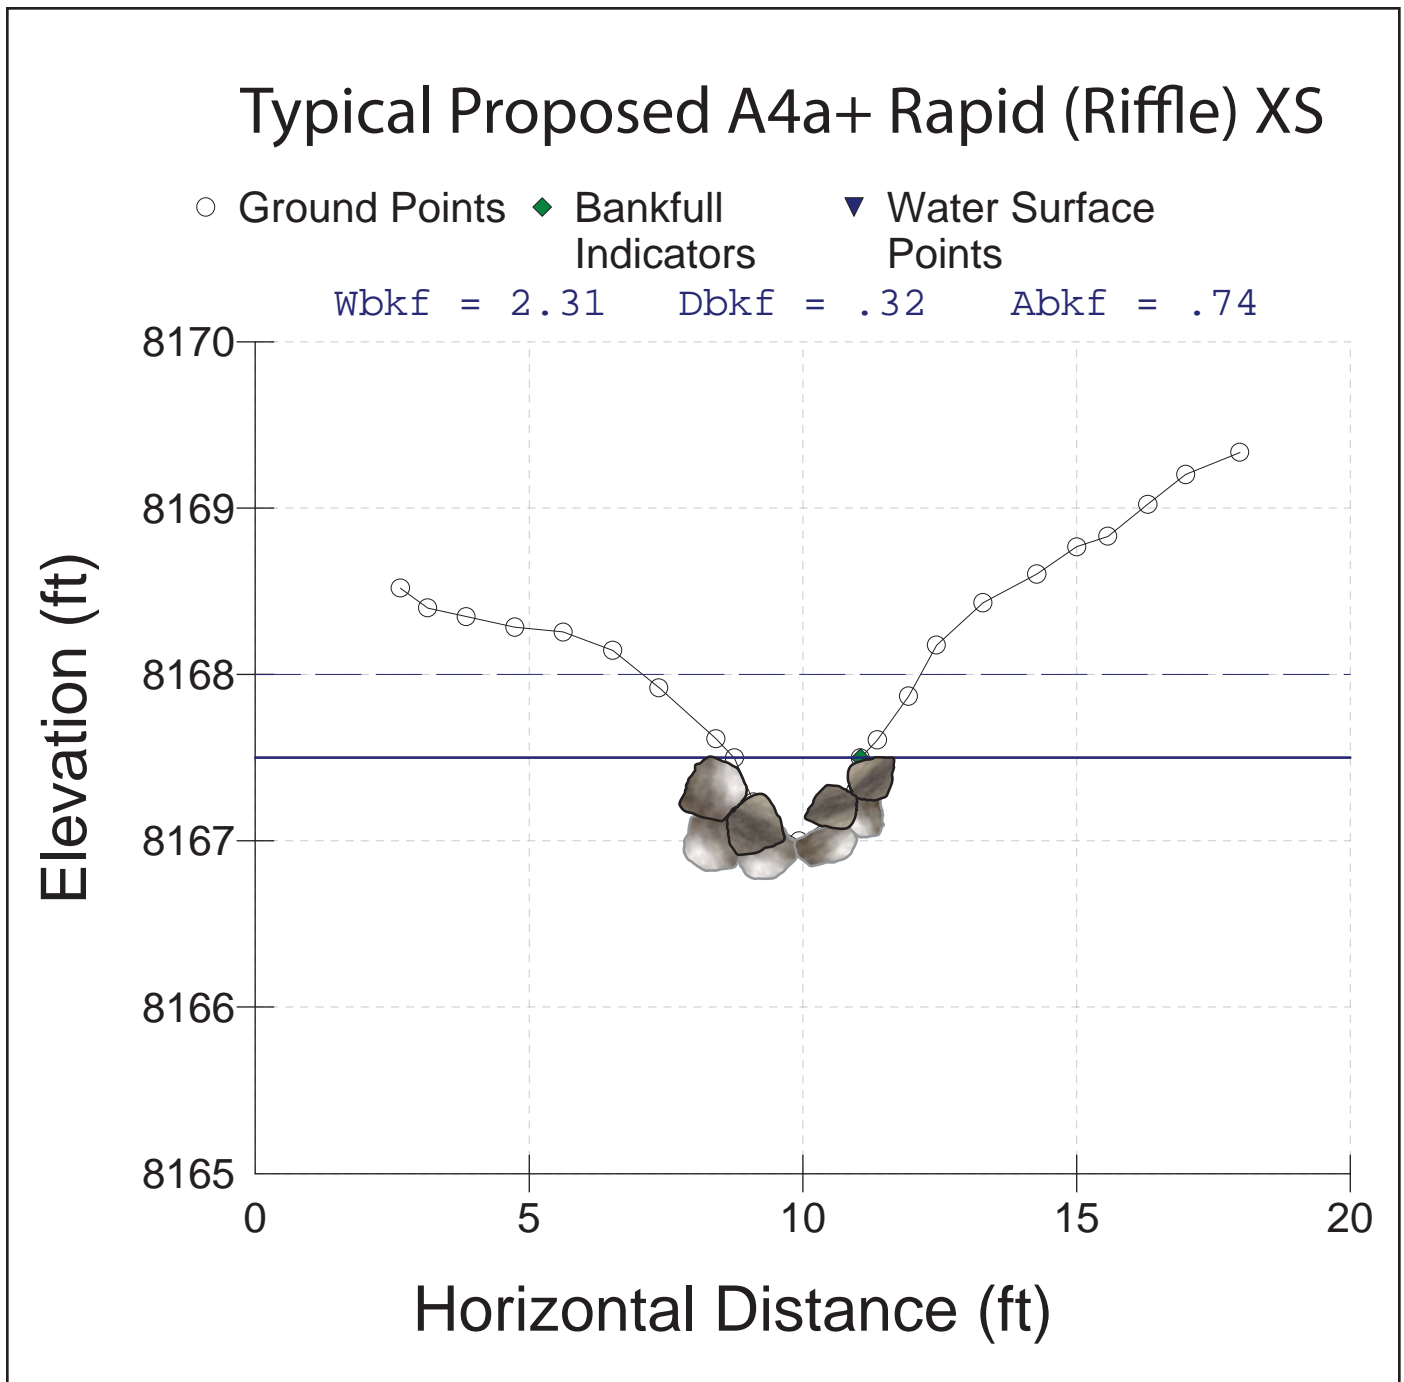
The typical rapid/chute (riffle) cross-section for the proposed A4a+ *Stable* step–pool design.
